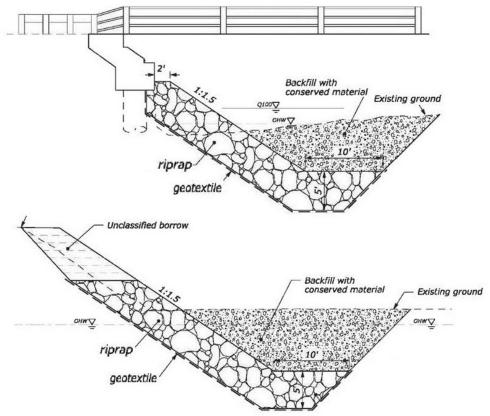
The south abutment revetment on the Carbon River at FSR 7810-0.0. The upper image shows the planned revetment under the bridge. The lower image shows the revetment extensions that would be installed along the sides of the abutment.
